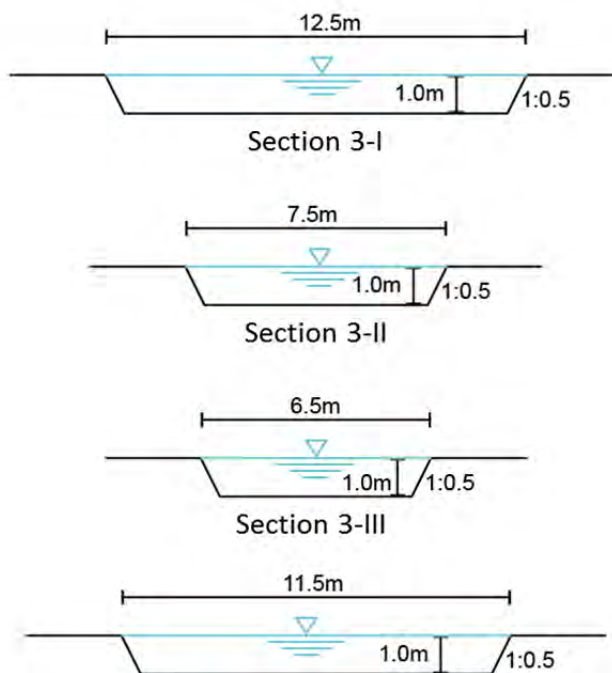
Cross Section Plan (from Situ Sidomukti to Situ Cilodong)
